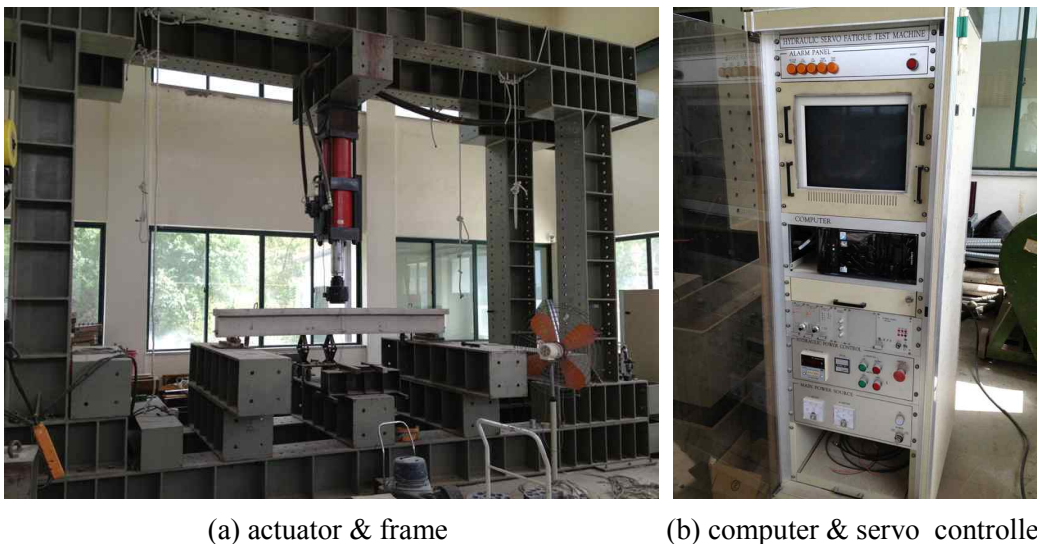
Testing machine(Servo-hydraulic load frame)
